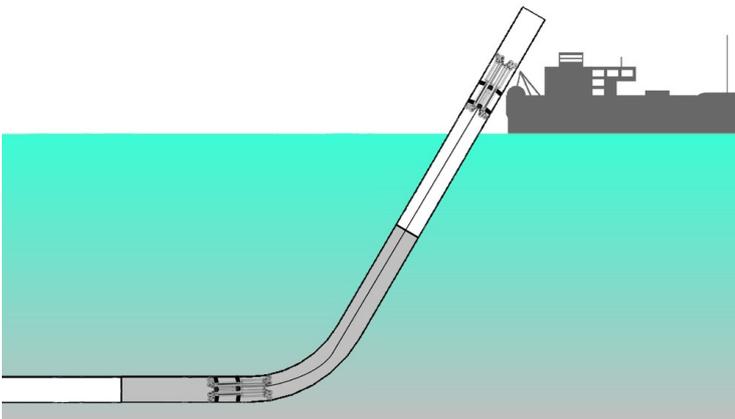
Both DPT crawlers advance and the bottom crawler inspects the newly laid section
